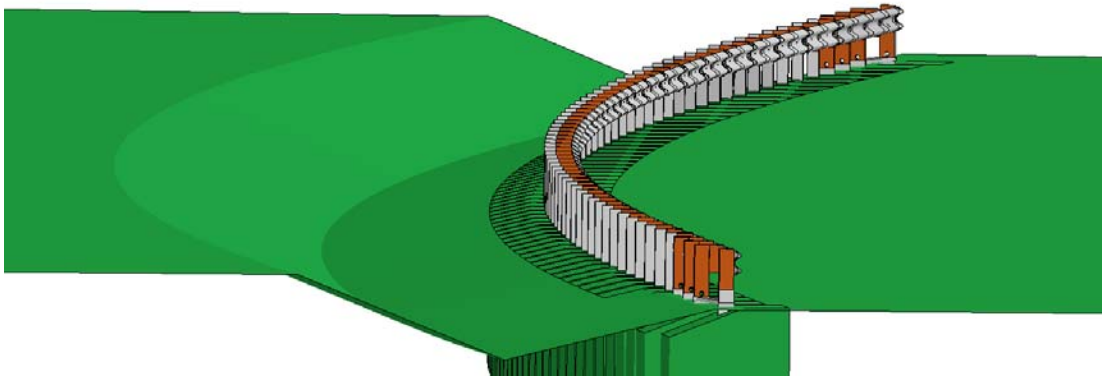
FE model of a single-faced guardrail with concave horizontal curvature installed on a 4H:1V slope.
